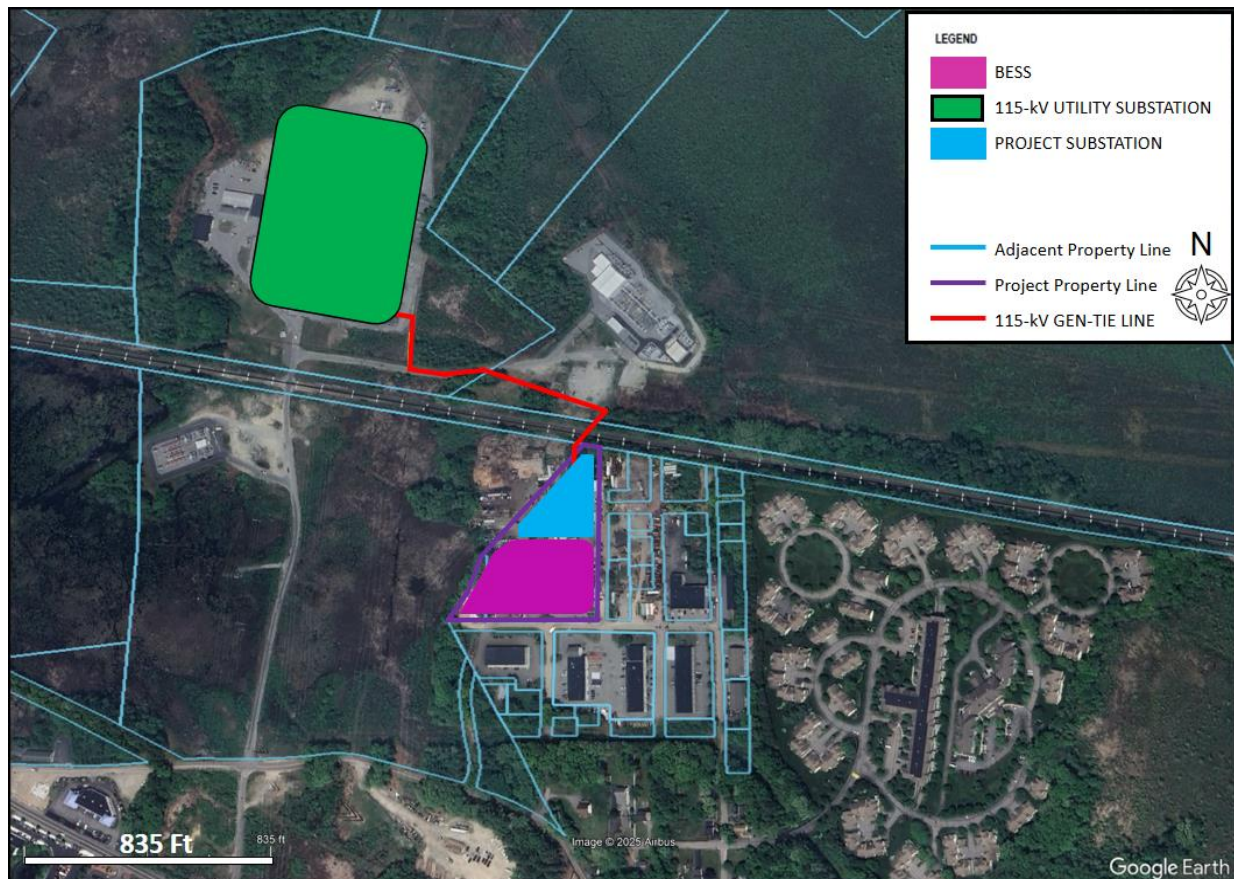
Proposed Site Plan for the 125-MW BESS in Tewksbury, Massachusetts.
